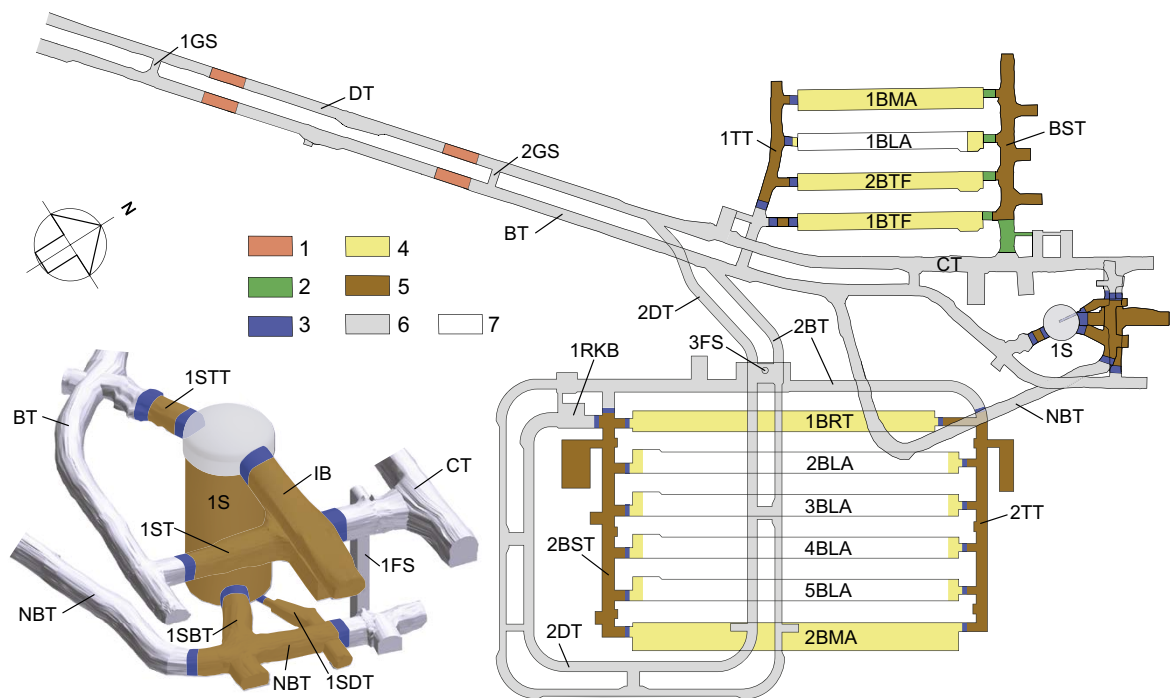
Schematic plan for backfill and plugs in SFR1 and SFR3, with a detailed view of the silo. Key to numbering: 1) Plugs in access tunnels 2) Transition material 3) Mechanical constraint of concrete 4) Backfill material of macadam 5) Silo bentonite and hydraulically tight section of bentonite 6) Backfill material in silo top, access tunnels and the central area of the tunnel system 7) Non-backfilled openings. The labels in the figure will be referred to in the text.
